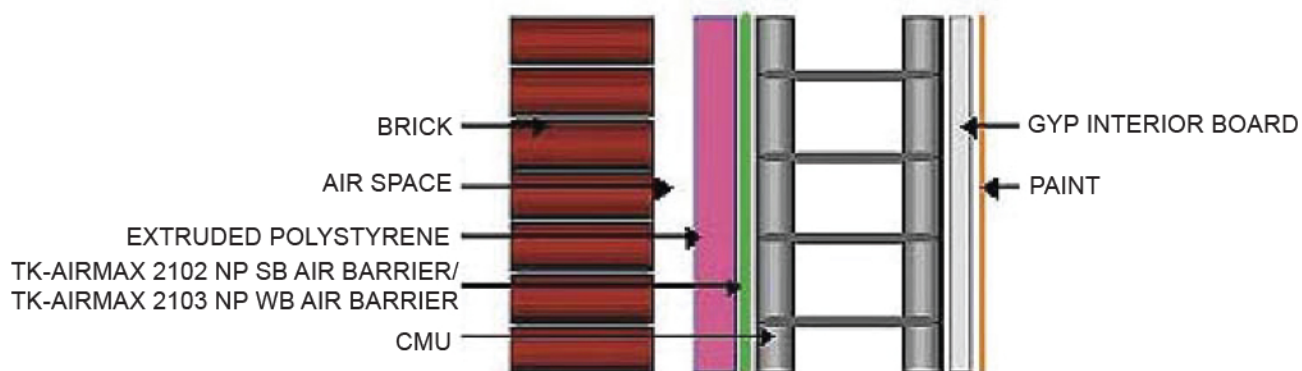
BRICK VENEER W/CMU BACK UP WALL
